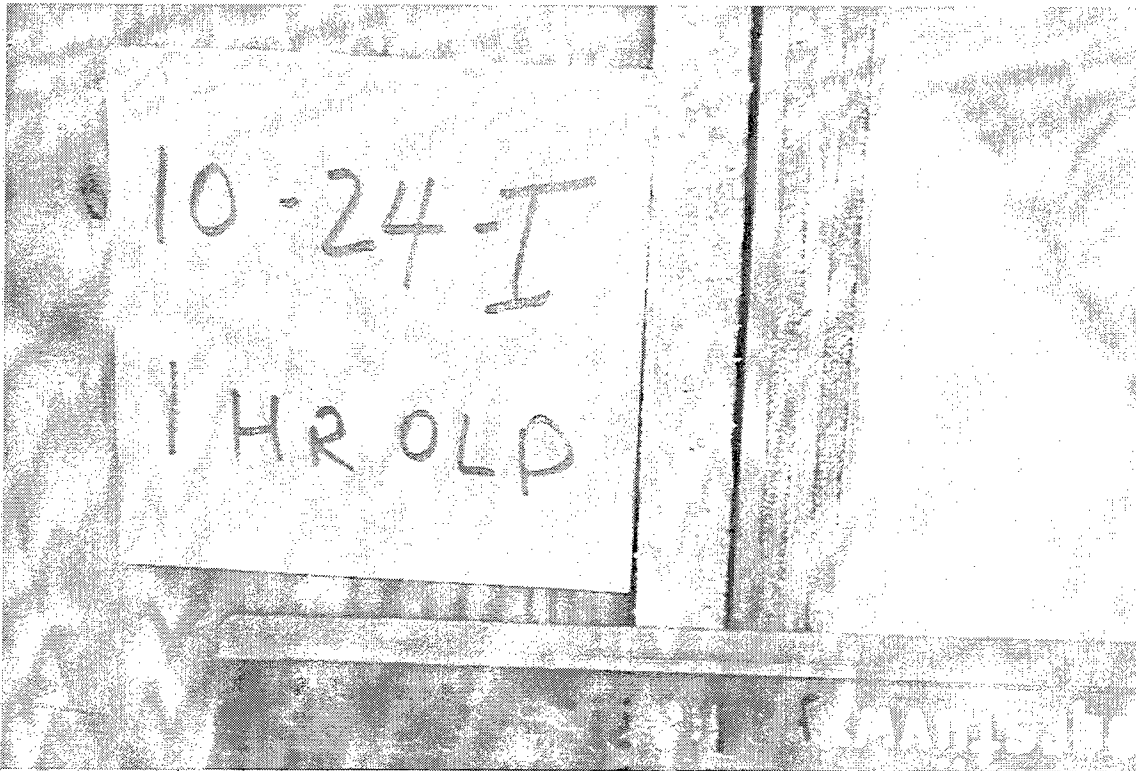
Cement-board formwork coated on the outside shows moisture penetration 1 hr after placement of foamed concrete
